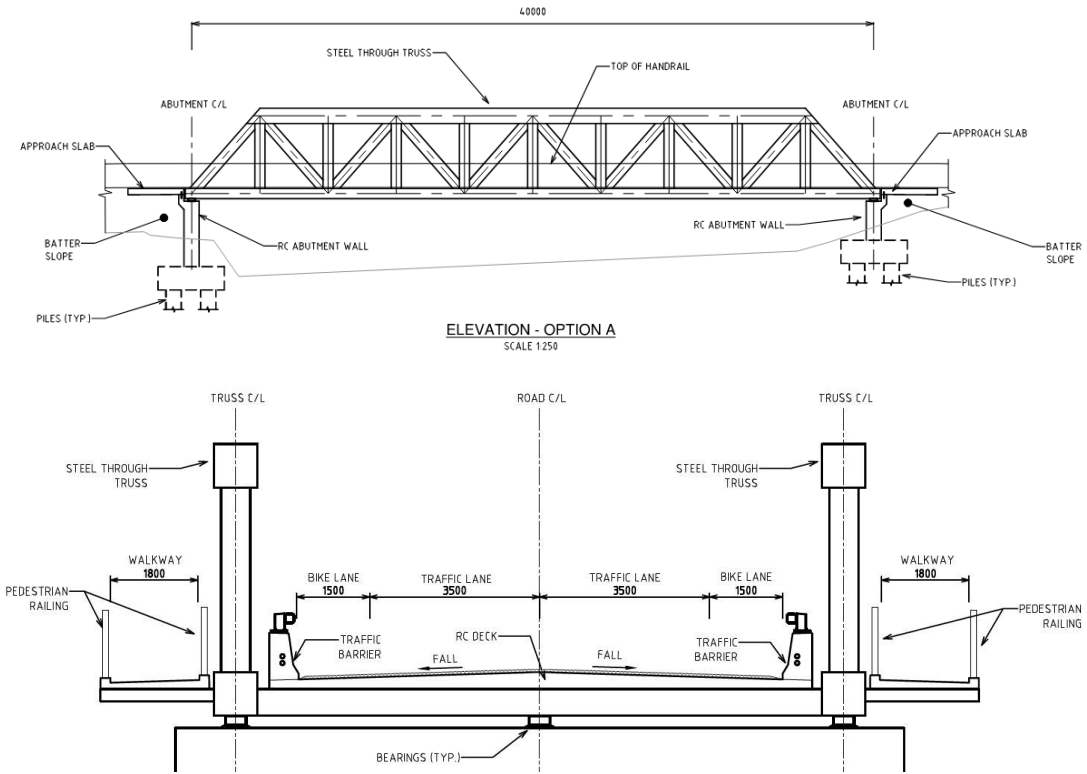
Edwards Bridge Renewal: Option A – Typical elevation and section
